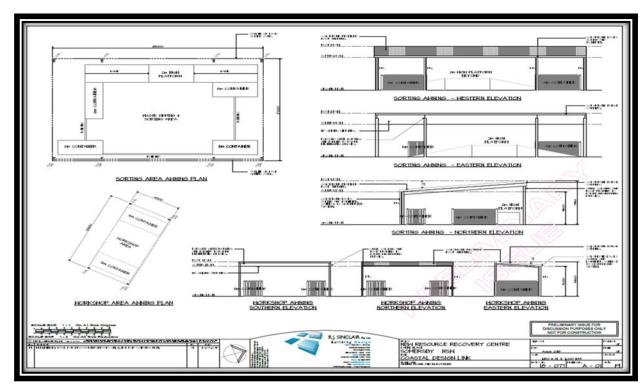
Sorting Area Awning Plan and Workshop Awning Elevations
